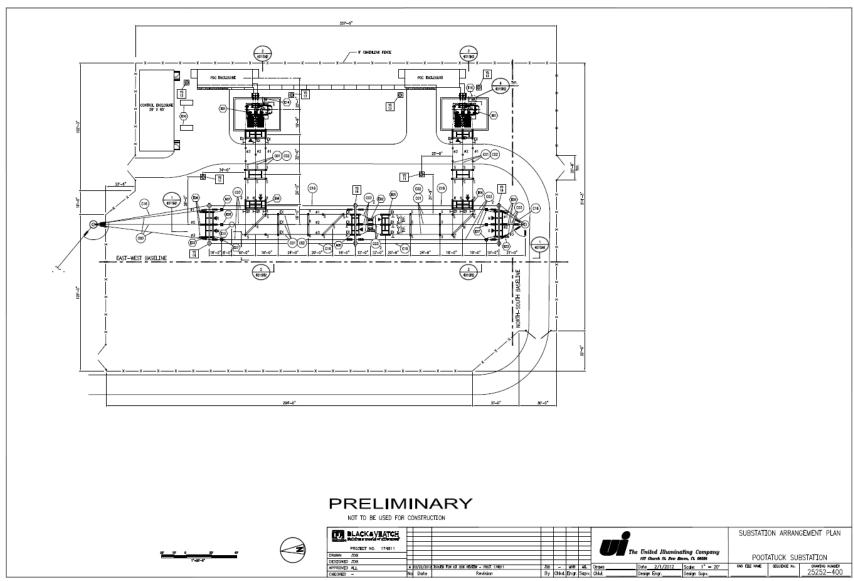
Proposed Substation Layout & Plot Plan at Site 2 - Old Stratford Road
